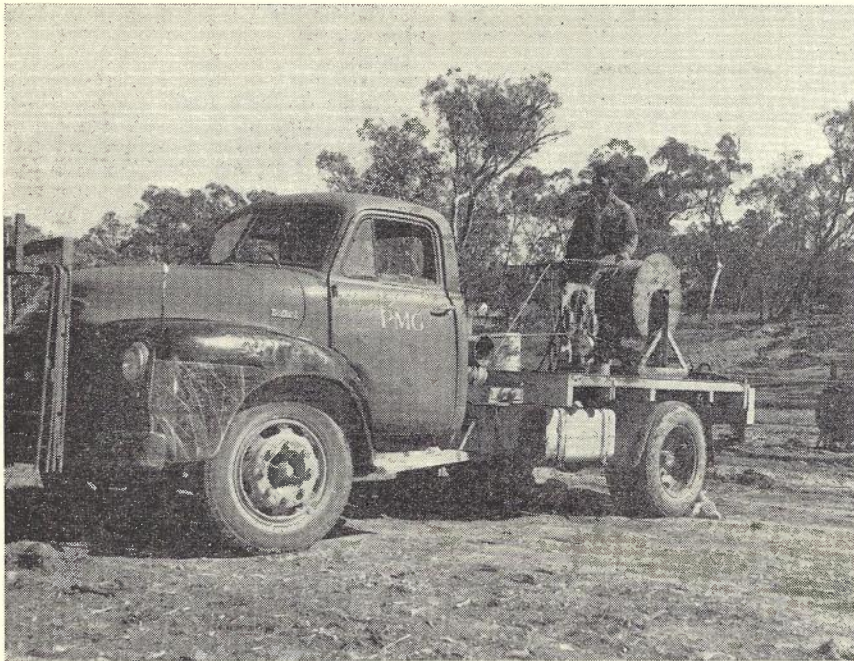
Cable Hauling Winch Truck Showing the Dynamometer and Take Up Spool.
